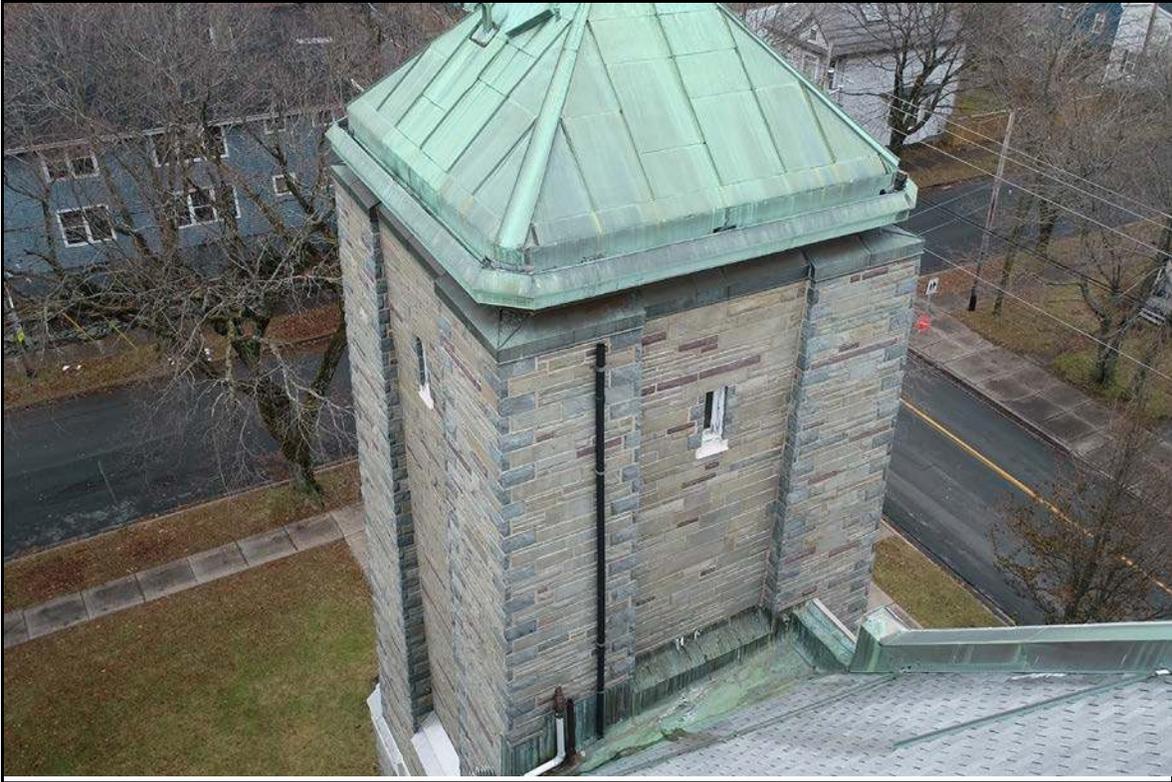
Spalling To Special Shapes At The South Elevation Deteriorated Windows
